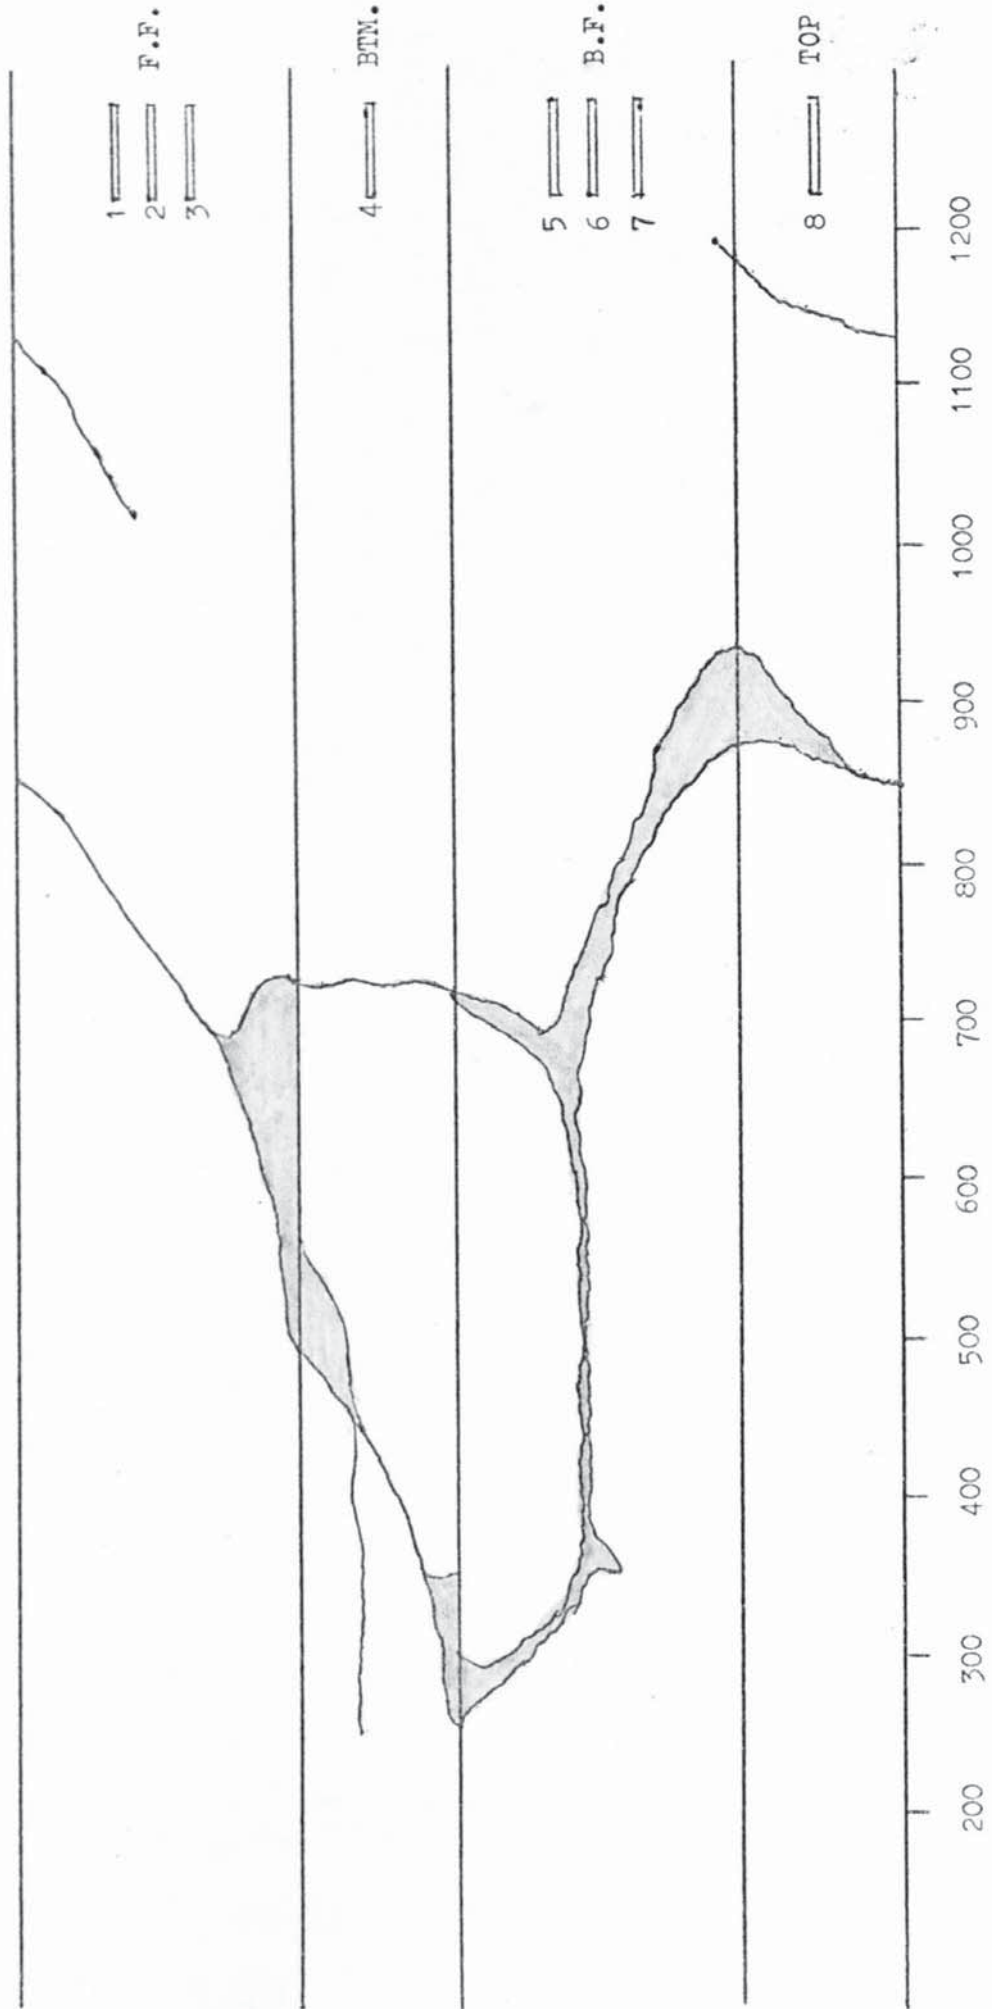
FAILURE CRACK PATTERNS - BEAM 20 (MODE 2)
